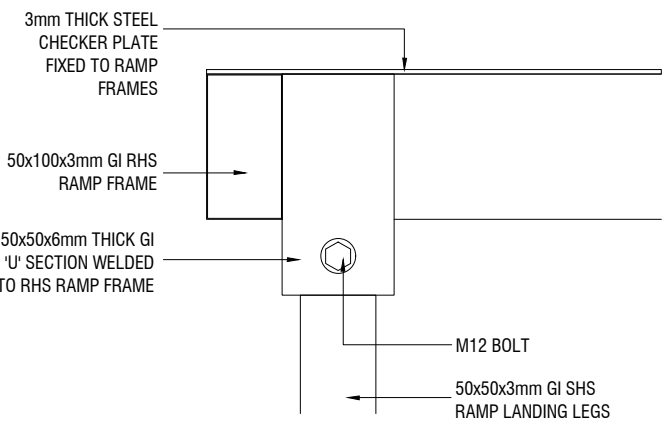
(MAIN ENTRANCE RAMP DETAIL)
